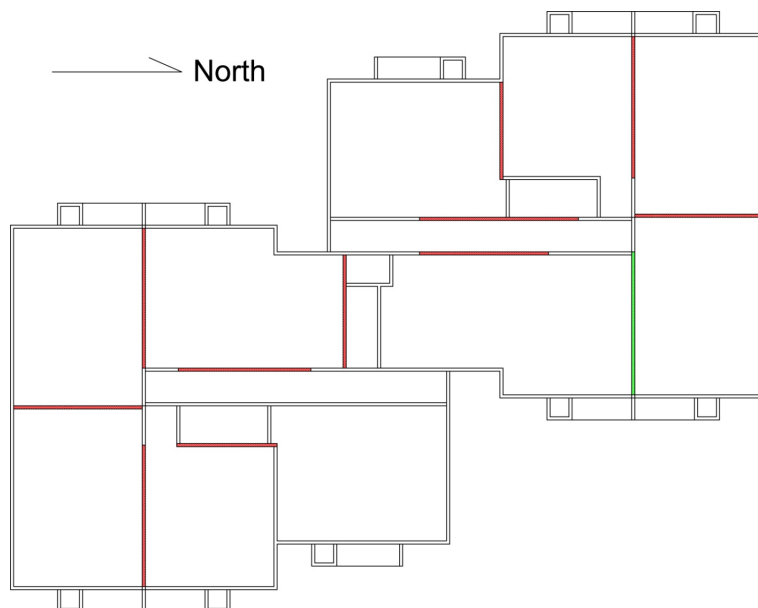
Layout of shear walls. Green wall indicated shear wall absent on floors 1 and 2.
